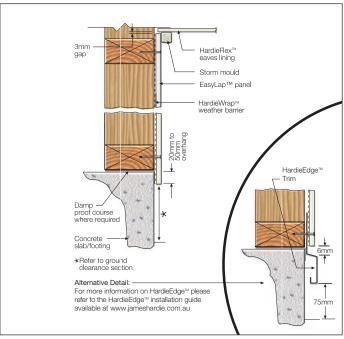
SLAB/EAVE JUNCTION DETAIL
